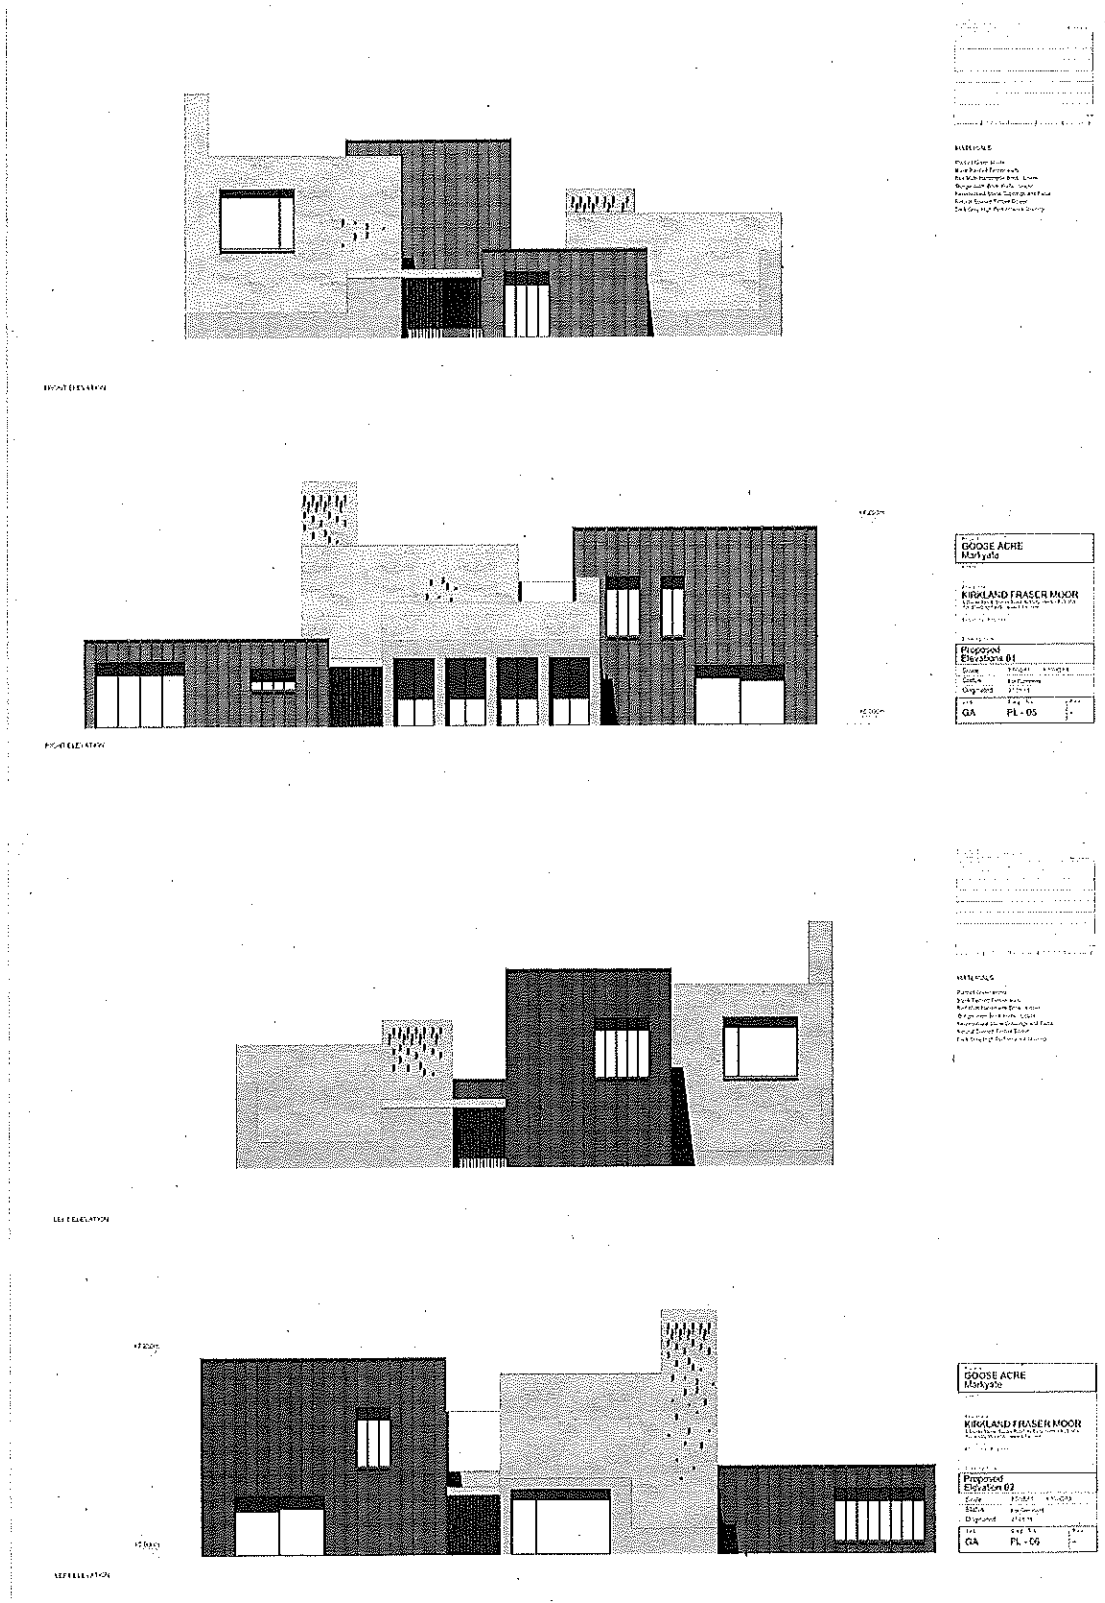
Proposed development – elevations (drawings by Kirkland Fraser Moor)
